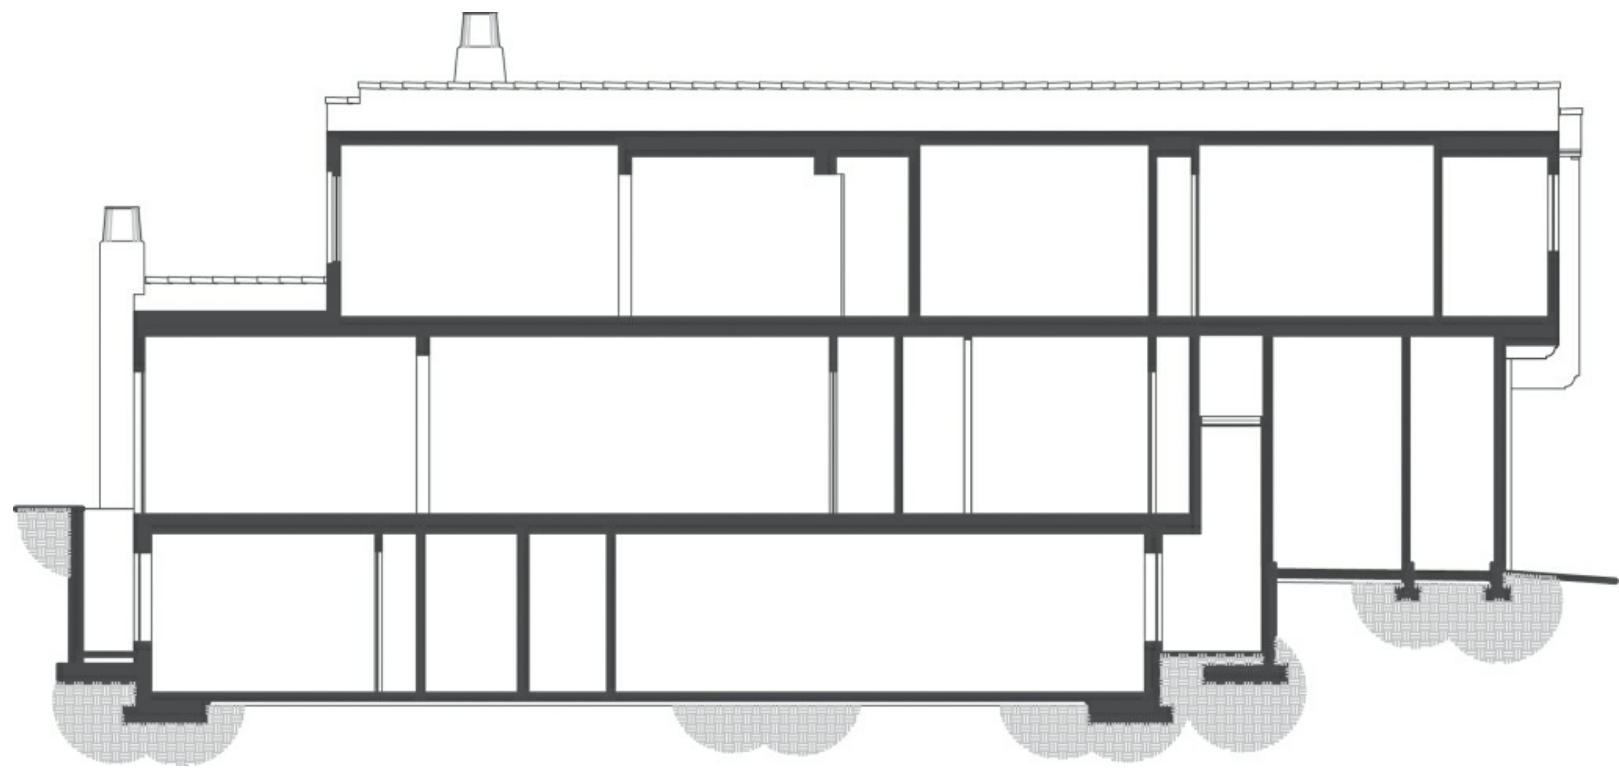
(#) shows a building section through a residence that has complex framing. Here, you can clearly understand the need for a full section to see the existing conditions. When doing a full section, you should draw this type of section in a smaller architectural scale,  $\frac{1}{4}'' = 1' - 0''$ . Again, when you use a smaller scale for drawing sections, you must provide enlarged details of all relevant connections. The circled and referenced conditions in [Figure 10.13](#), for example, will be detailed at a large scale.
